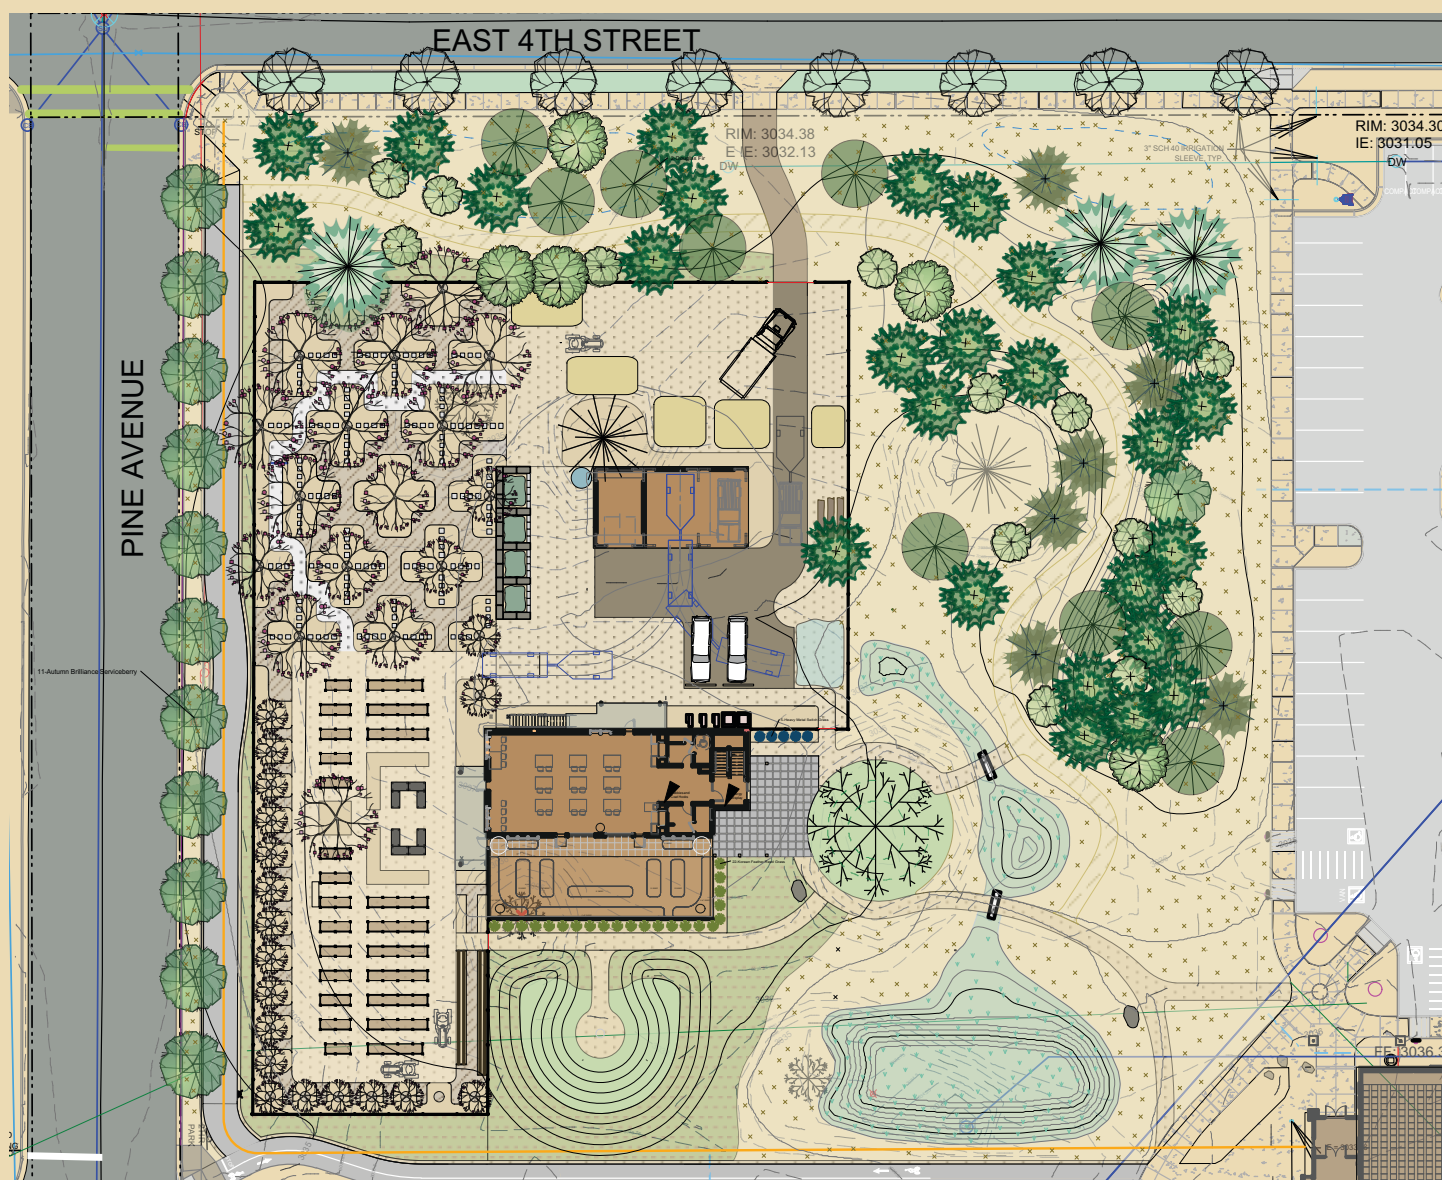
CENTER FOR SUSTAINABILITY AND ENTREPRENEURSHIP MASTER SITE PLAN
